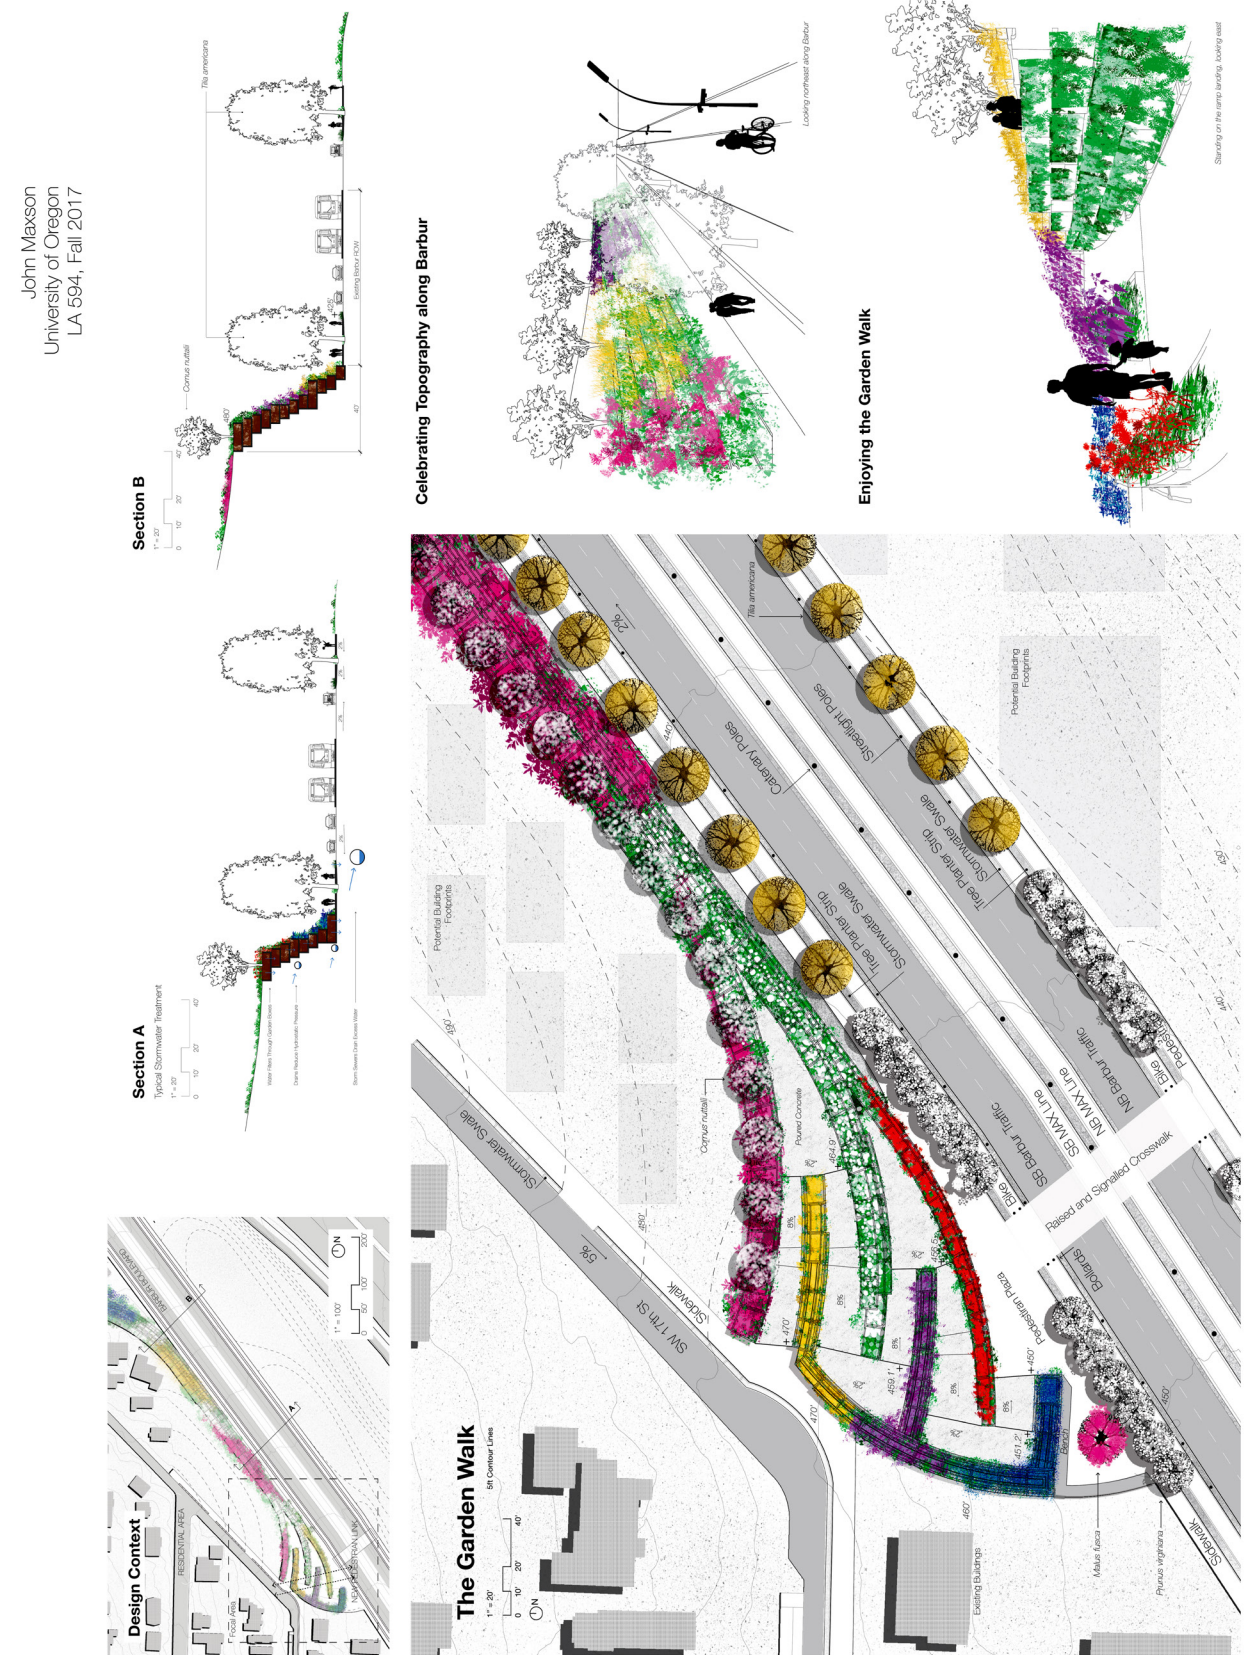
Plan, sections, and perspectives of the Garden Wall design.
